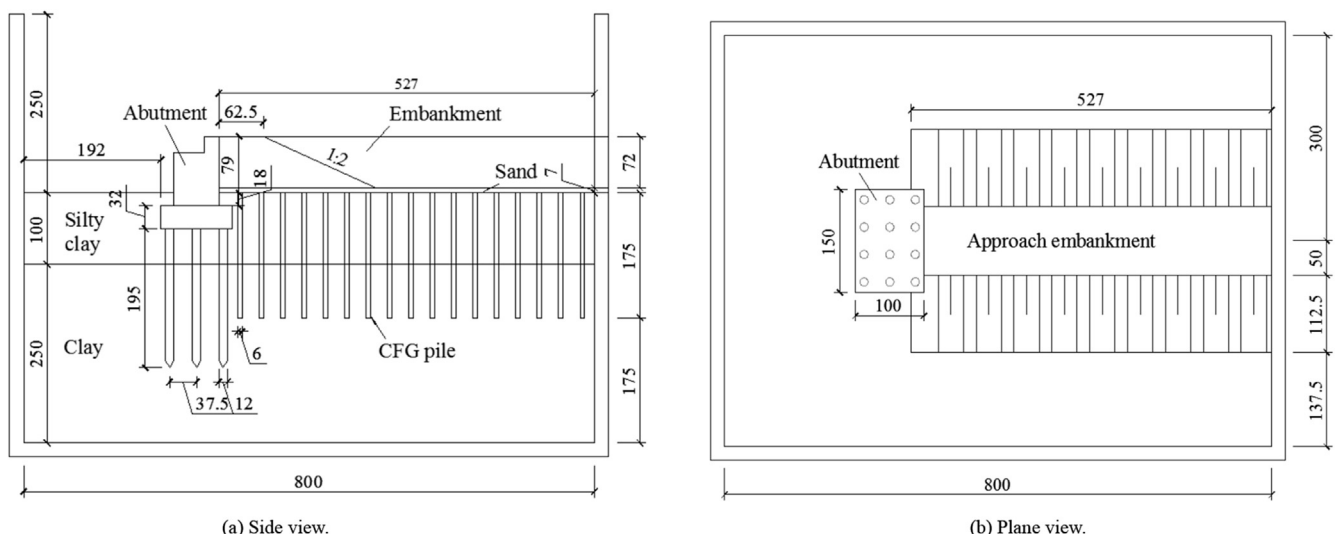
Schematic layout of bridge approach in the centrifuge model tests (unit: mm).
